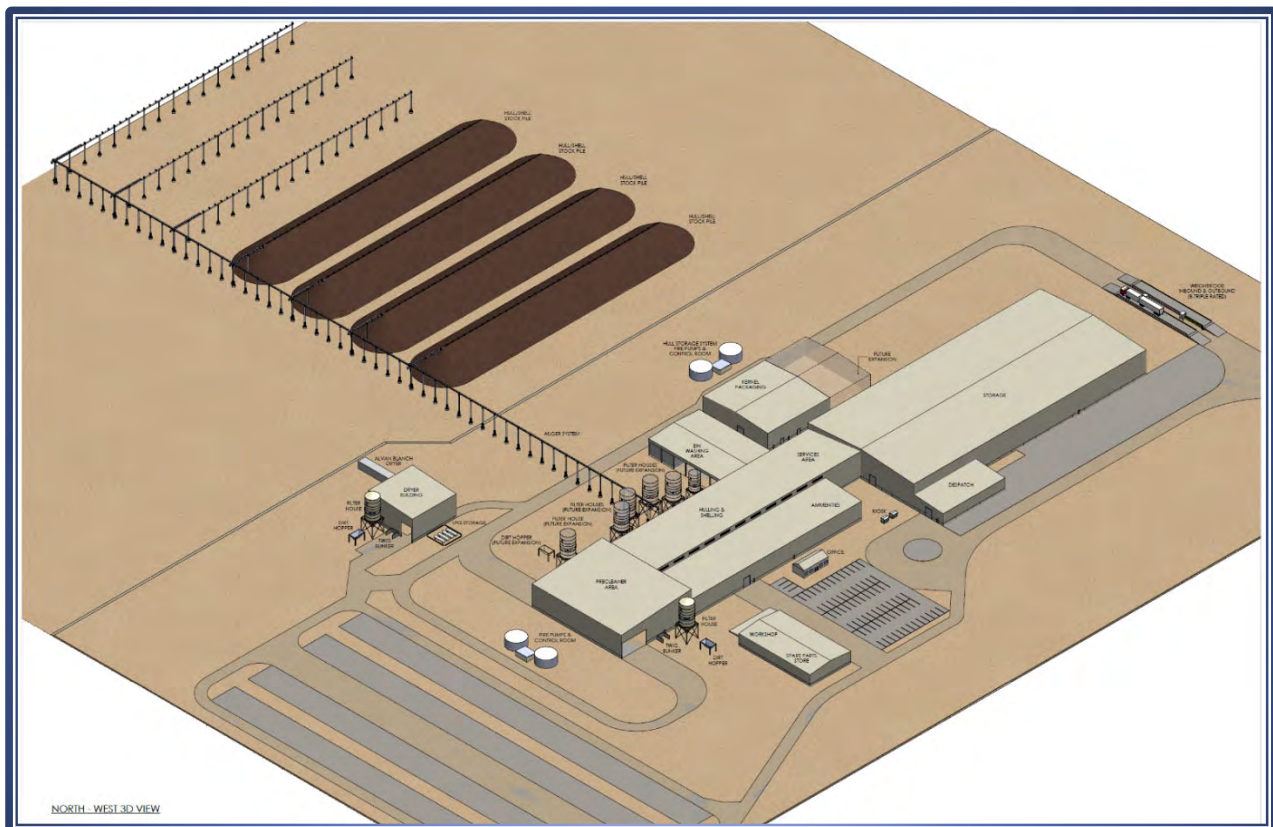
Photo showing proposed layout in 3D (Source JMA Plans – Sheet A301)
